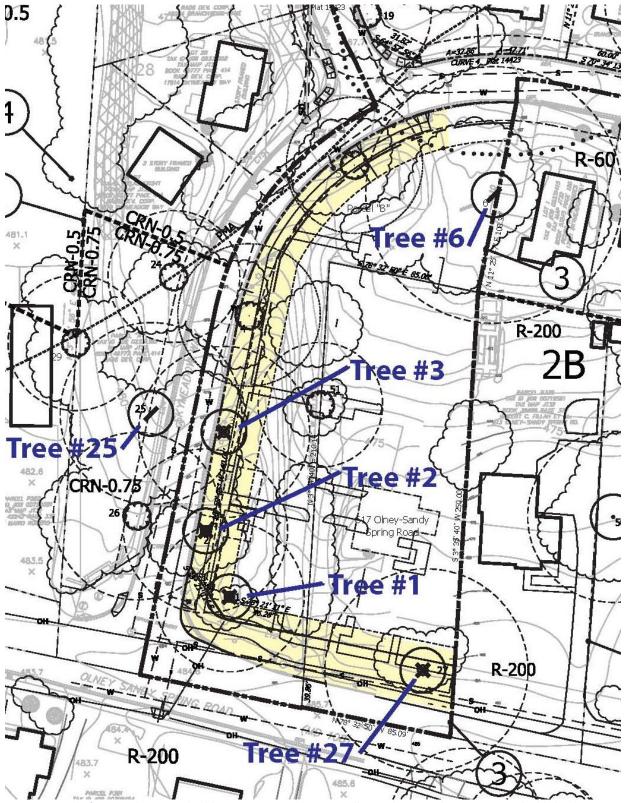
Detail of SNRI with proposed public improvements shown in yellow and impacted specimen trees highlighted.
